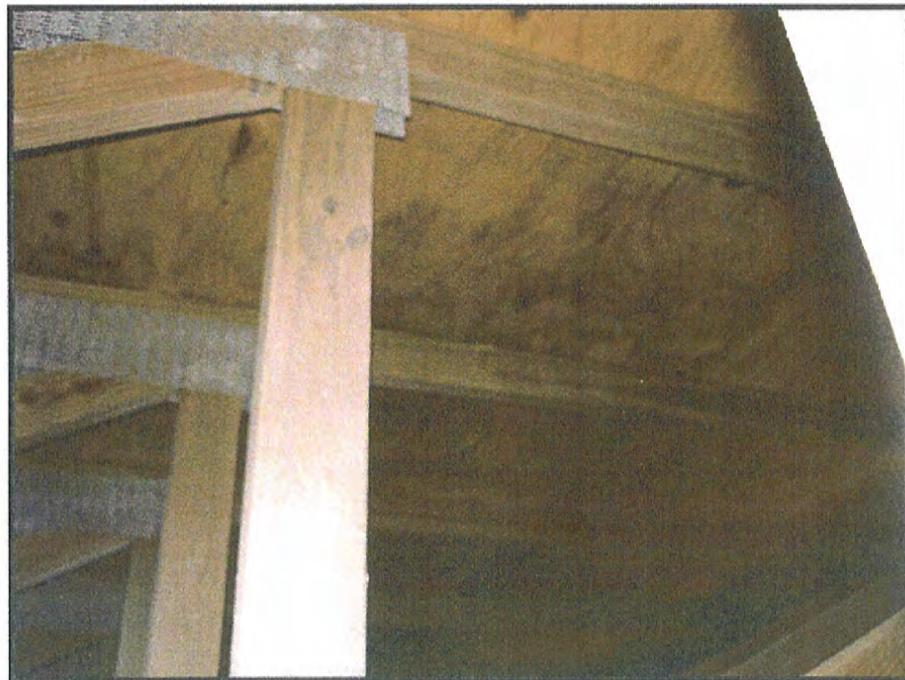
Typical condition of roof deck and prefabricated wood trusses.
